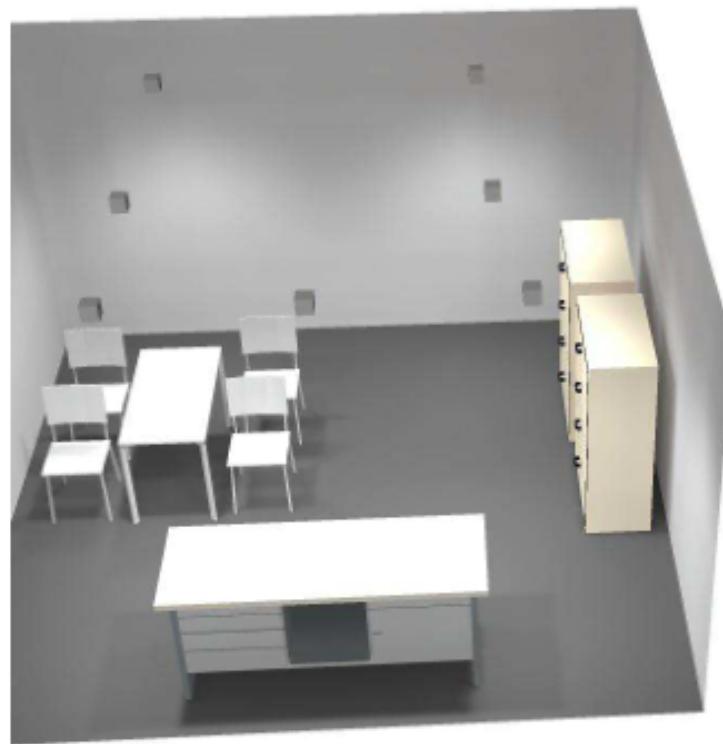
Initial Draft Floor Plan Lighting Test 3D Render
